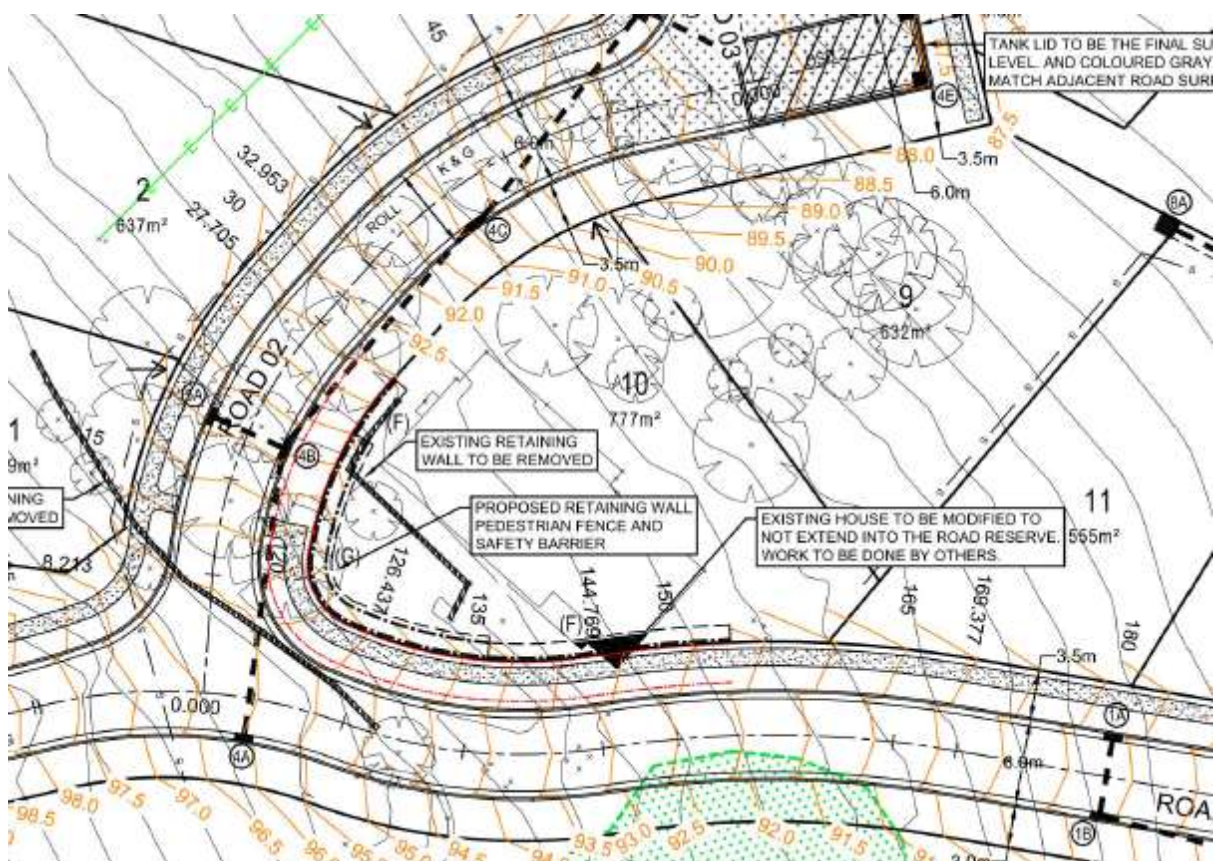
Approved Subdivision Layout (10.2014.161.2)
